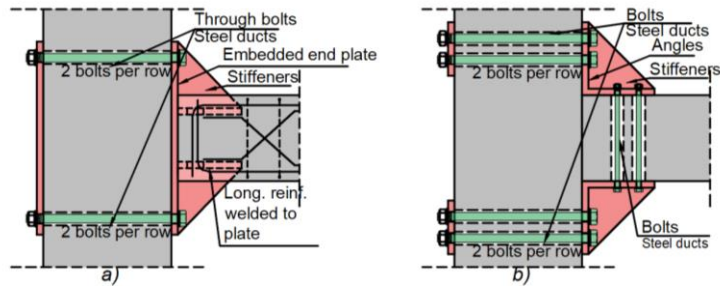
Beam-to-column connections with bolts adapted from [16]–[17]: a) connection with embedded steel end plate and stiffeners b) connection with steel angles and stiffeners
